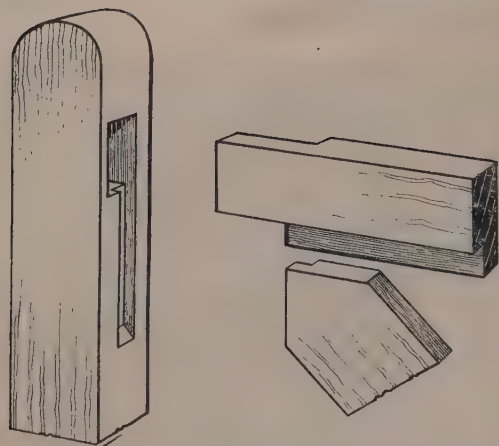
FRONT VIEW OF GATE JOINTS.
